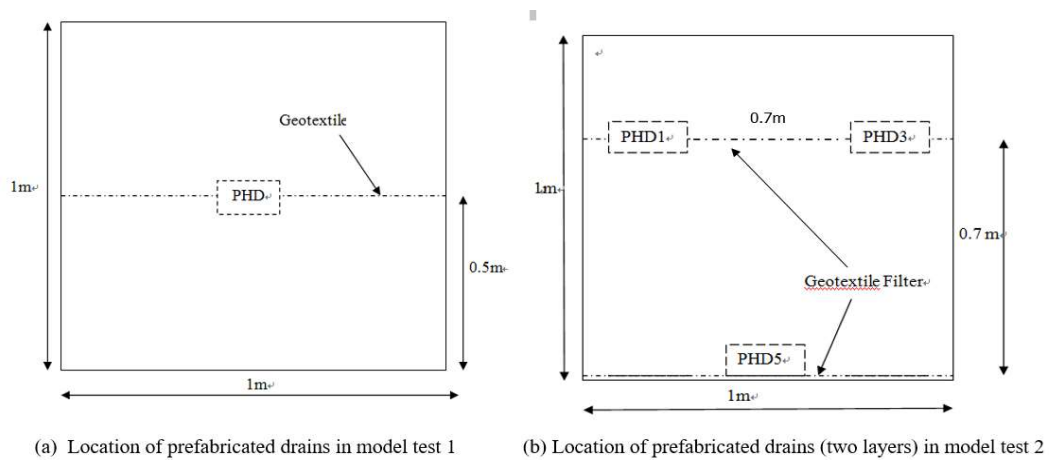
Schematic cross section layout of horizontal drains for Model test 1 and
